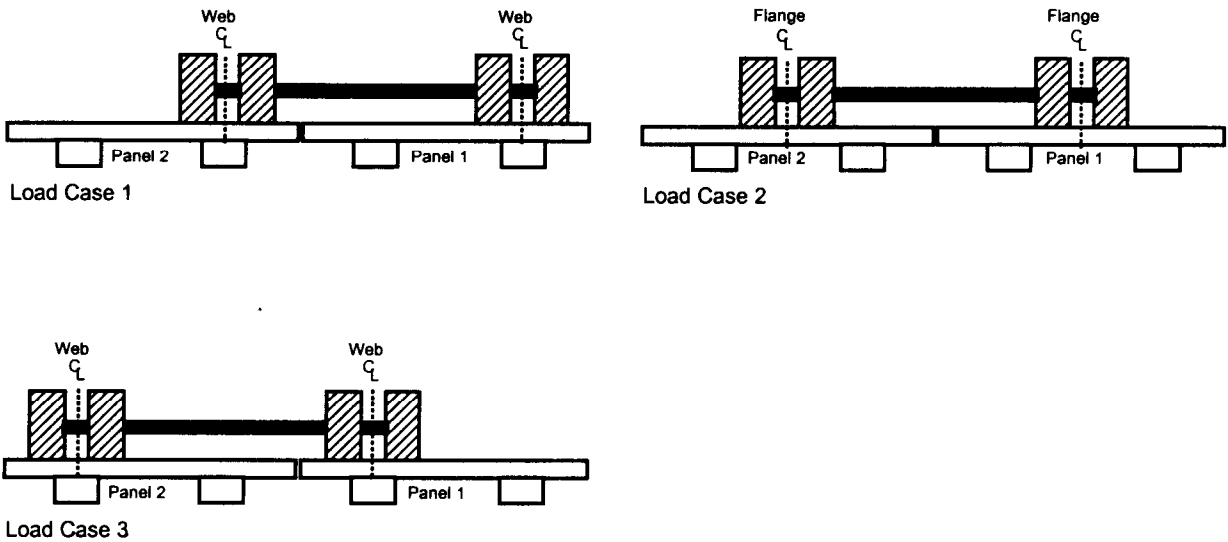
Transverse load positions (looking north) and deck panel numbers for the load test of the Morgan County bridge. For all load cases, the two rear axles were centered over the bridge centerspan.
